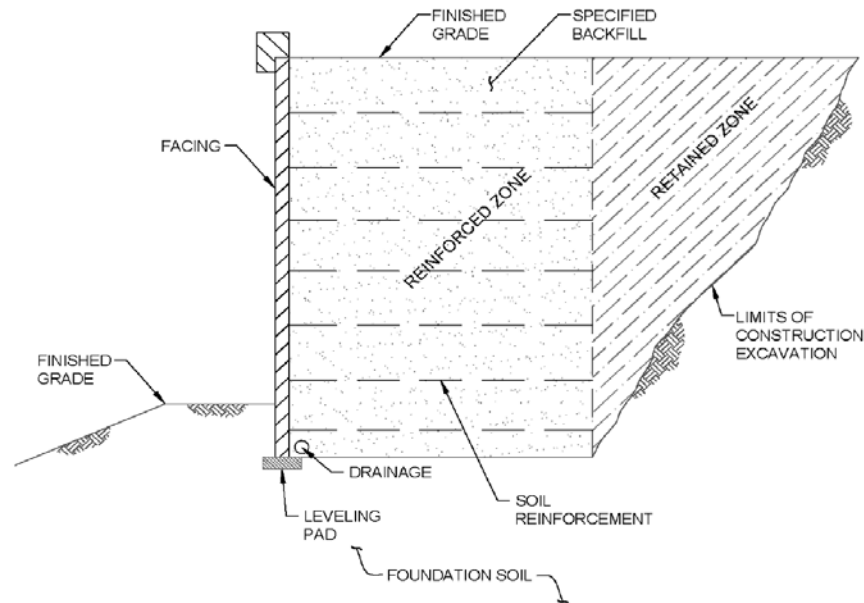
33 Typical MSE Wall Section (FHWA, 1995).
